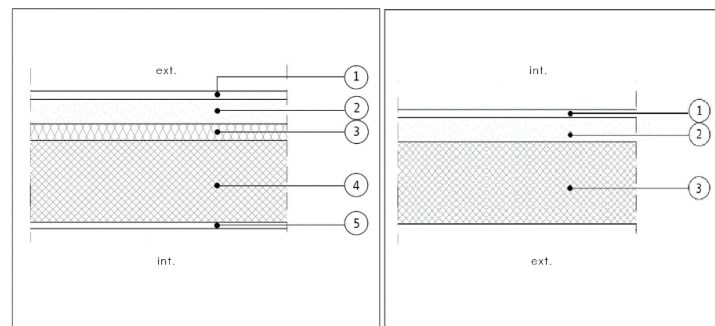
on the left: roofing stratigraphy detail (ante operam); on the right: close-up slab detail on external space (ante operam)
